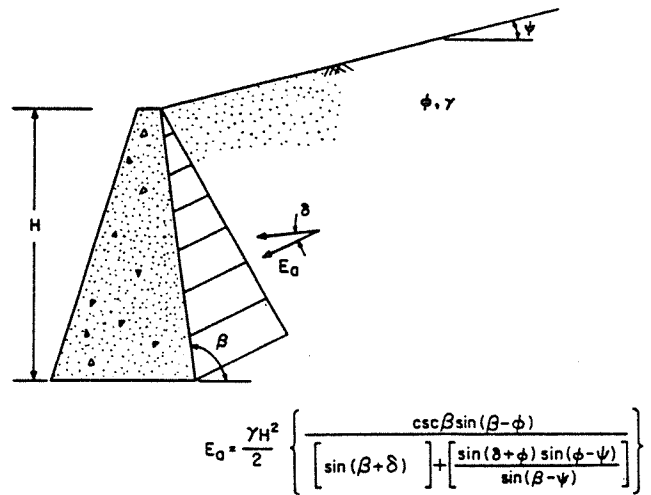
Closed-form solution for active earth loading, rough wall, sloping wall face, and backfill.
